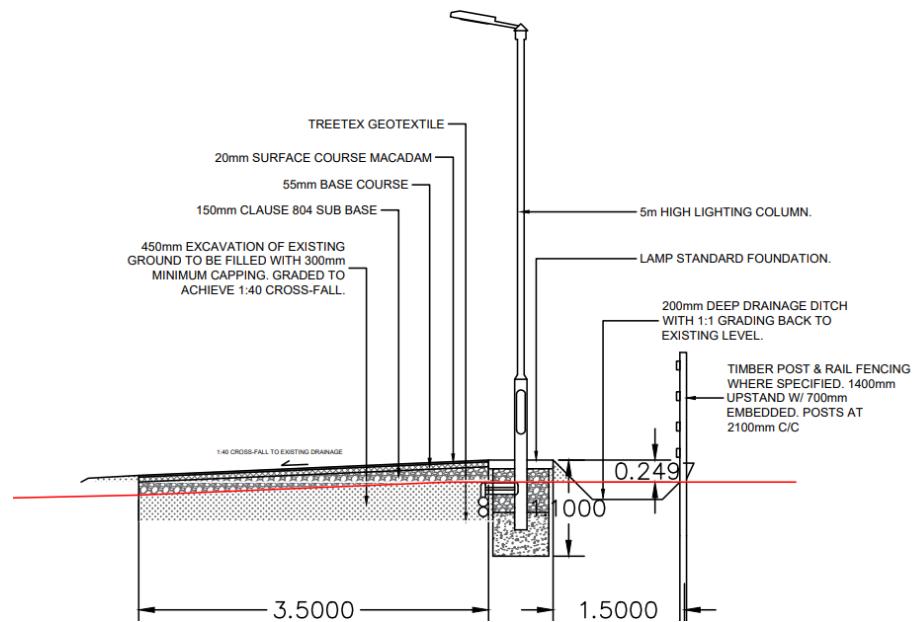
Proposed cross section of 3.5m greenway, public lighting column, and land drain
